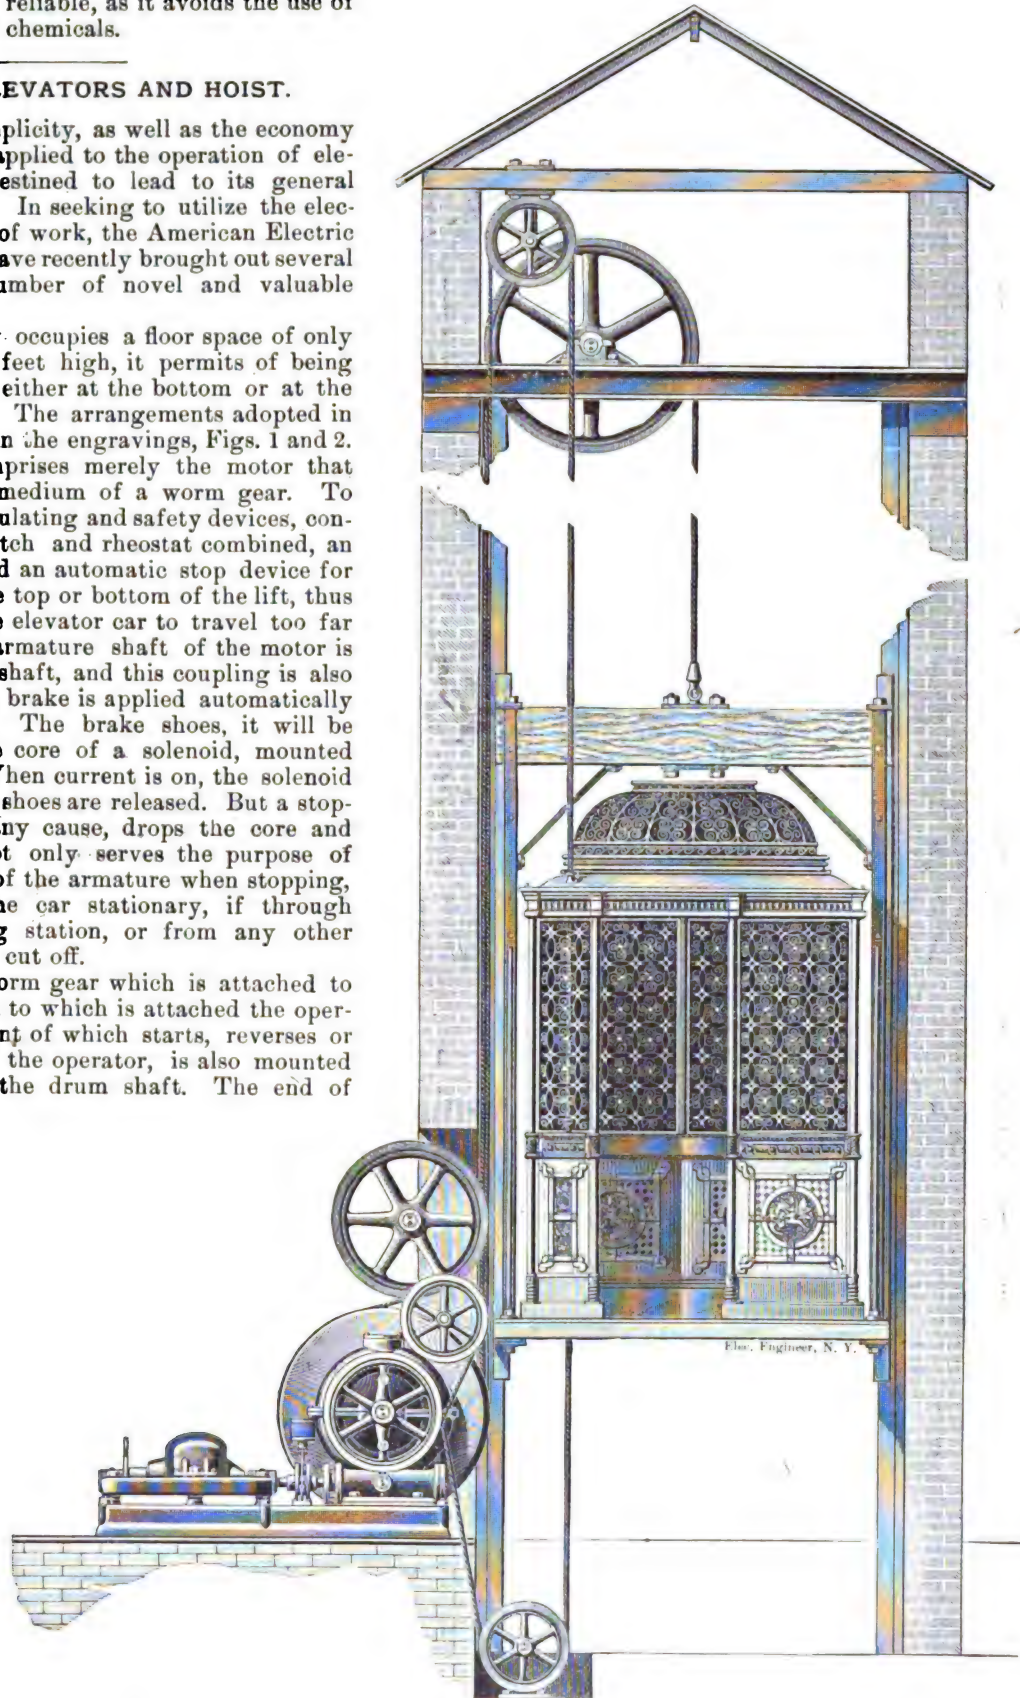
"AMERICAN" ELECTRIC ELEVATOR—MOTOR AT BOTTOM OF SHAFT.
